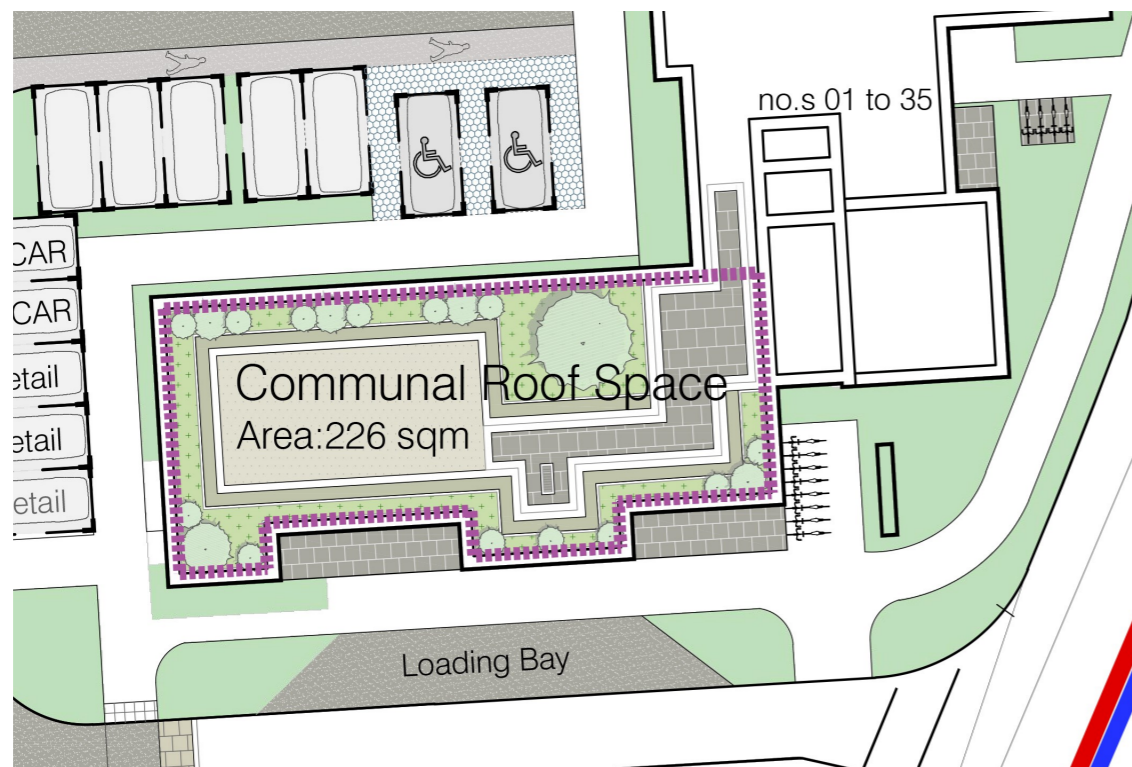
Proposed new roof garden providing 226sqm communal space to Apartment residents
